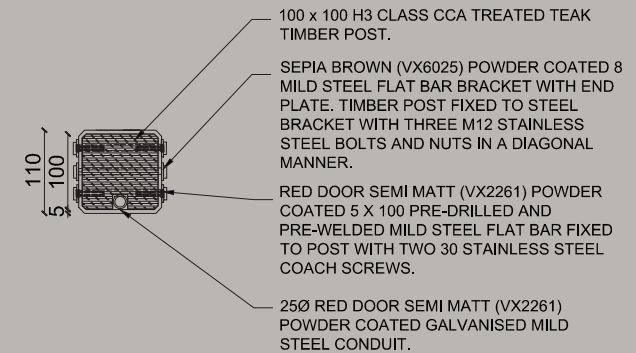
Detail Plan (1:10) of Bollard (Author, 2014).
